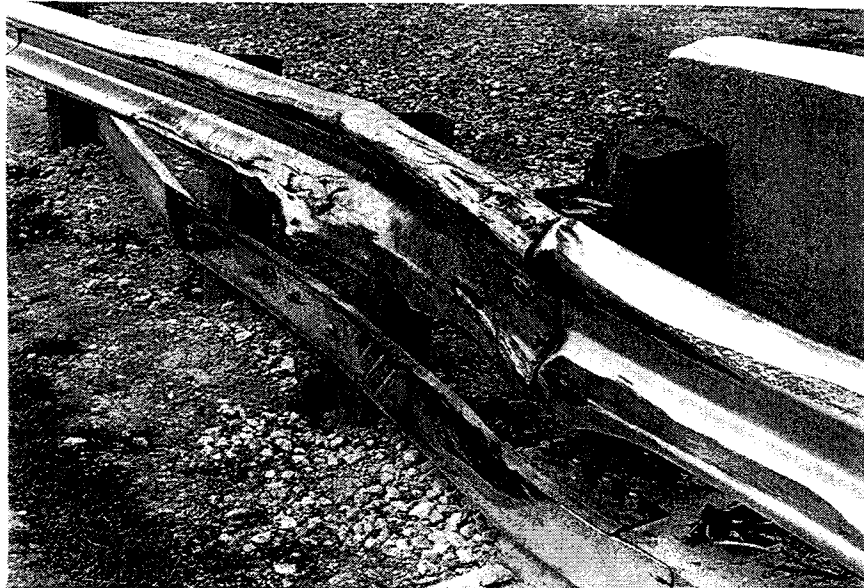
Damage to W-beam and bridge railing end post after test 472070-3.
